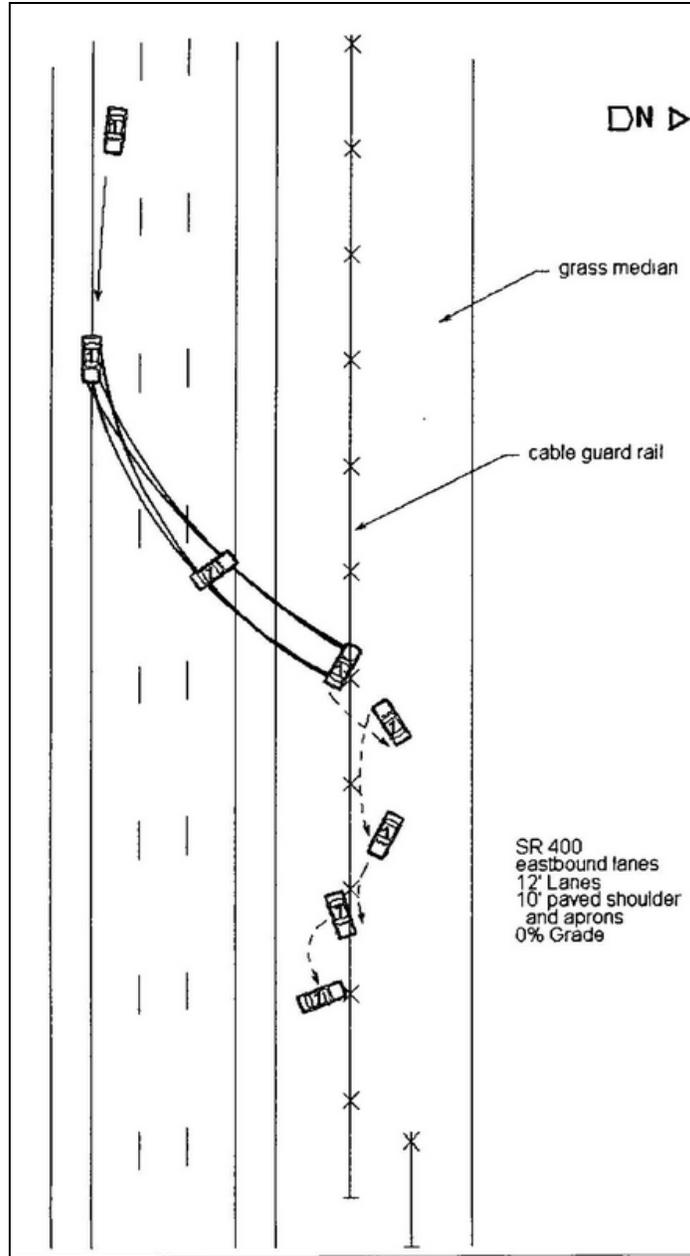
Example of a Barrier Crossover Penetration Crash (Crash # 771491090)
